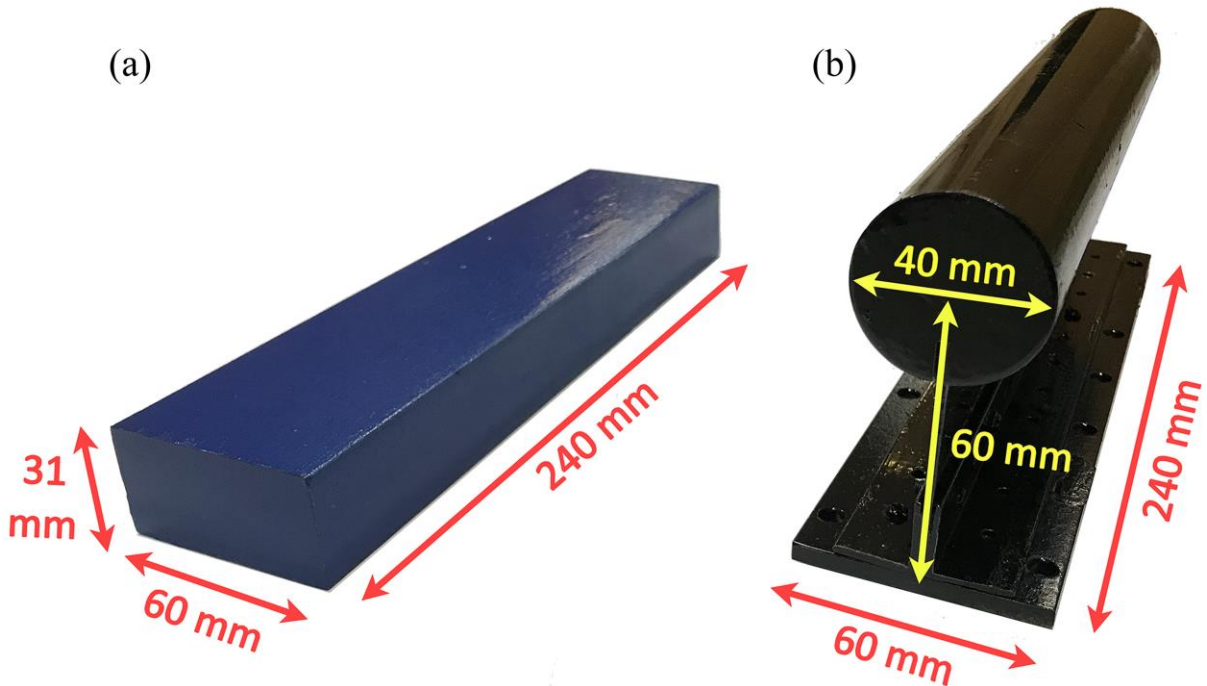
Structure models; (a) shallow foundation, (b) SDOF super-structure on shallow foundation
